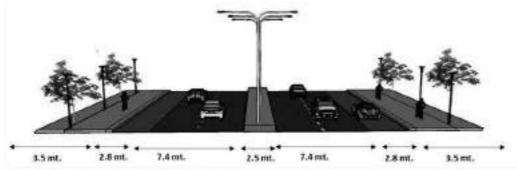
Cross Section of 30m wide Sub-Arterial Road
